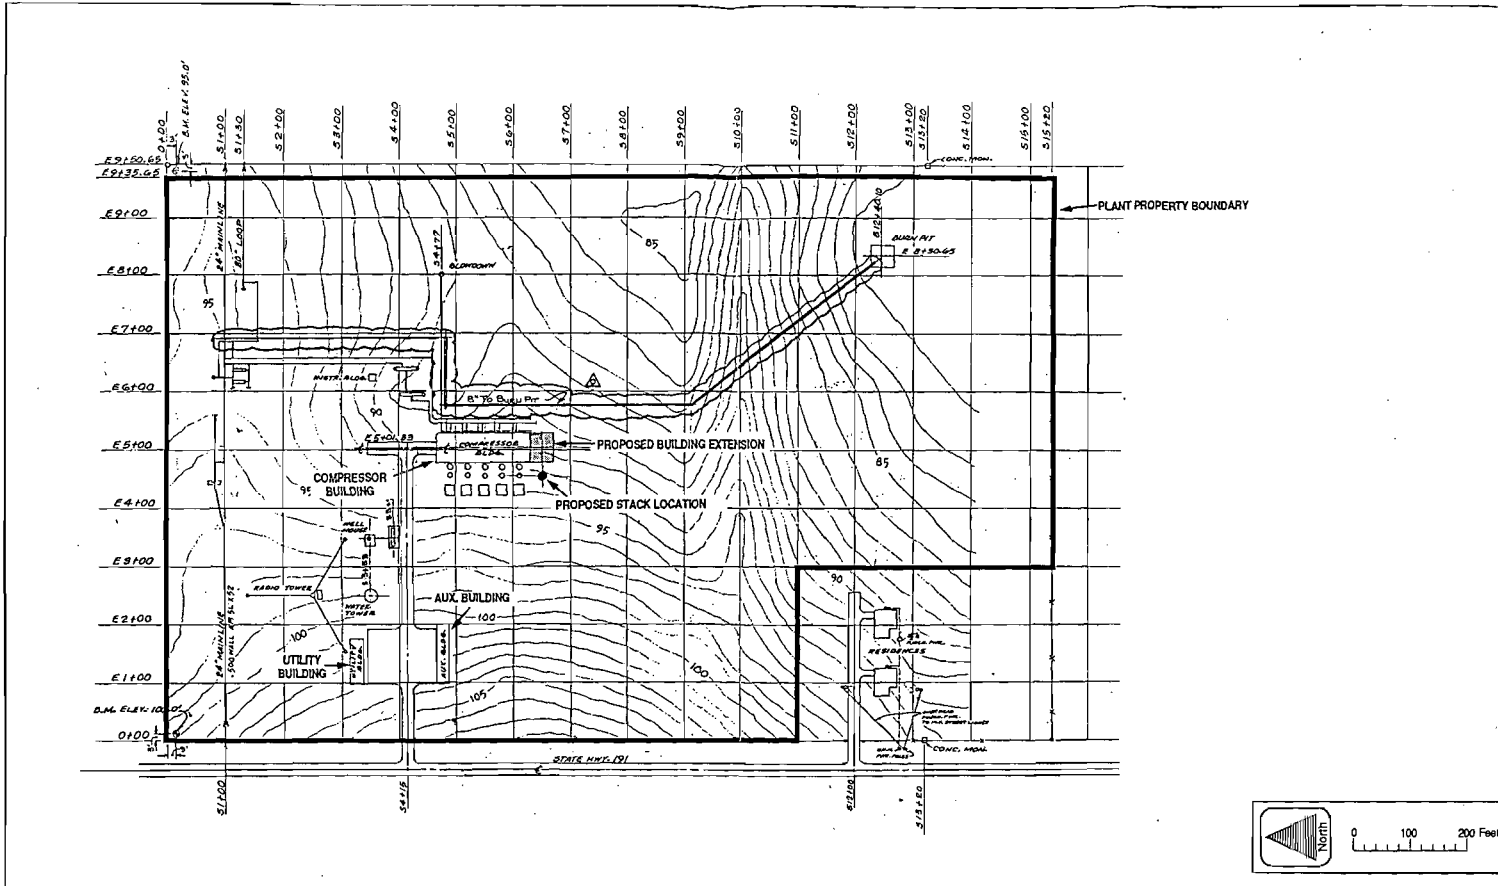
PLOT PLAN OF COMPRESSOR STATION NO. 12
